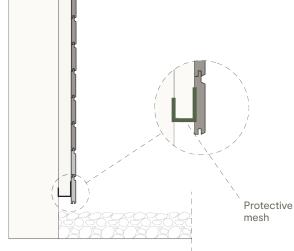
Protective mesh for horizontal cladding on a single-layer frame
